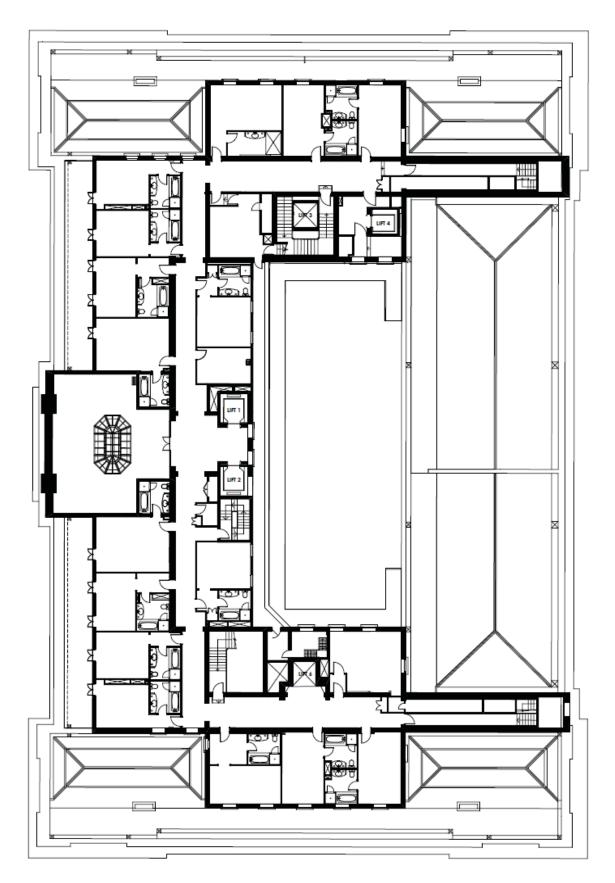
Floor Plan, Level 4 Source: ML Design 2016
